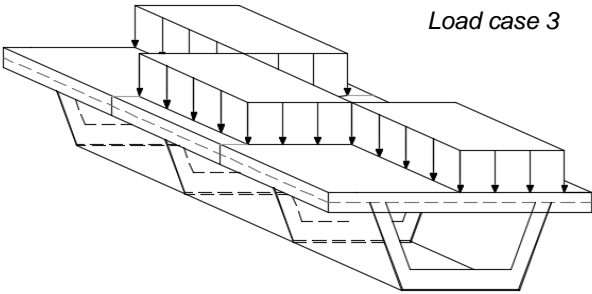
Additional loading arrangement considering two internal diaphragms
